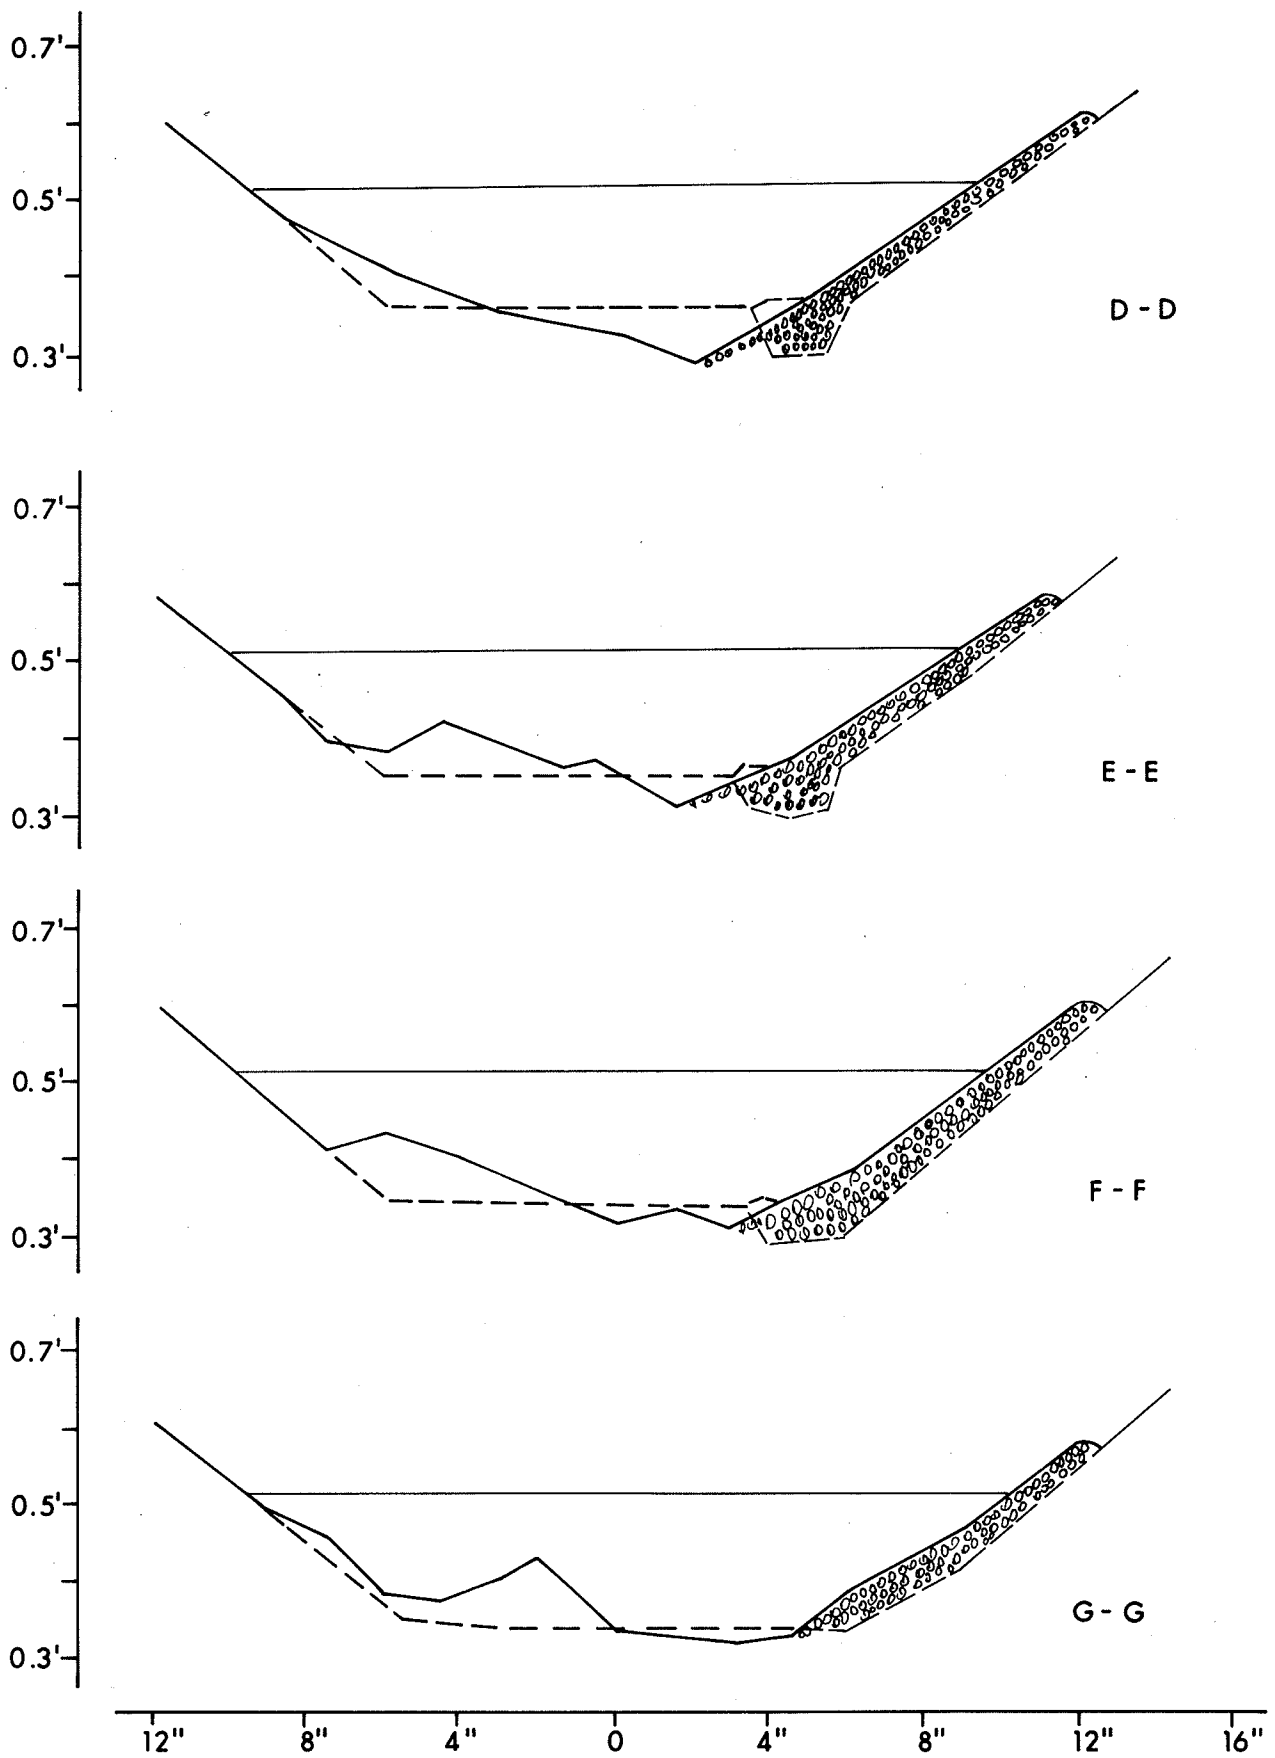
CROSS-SECTIONS FOR TEST No.4.
